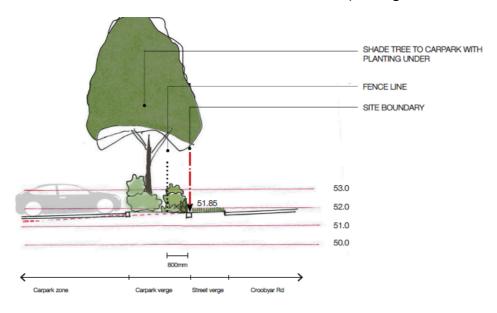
Section detail showing carpark buffer landscaping Source: Group GSA
